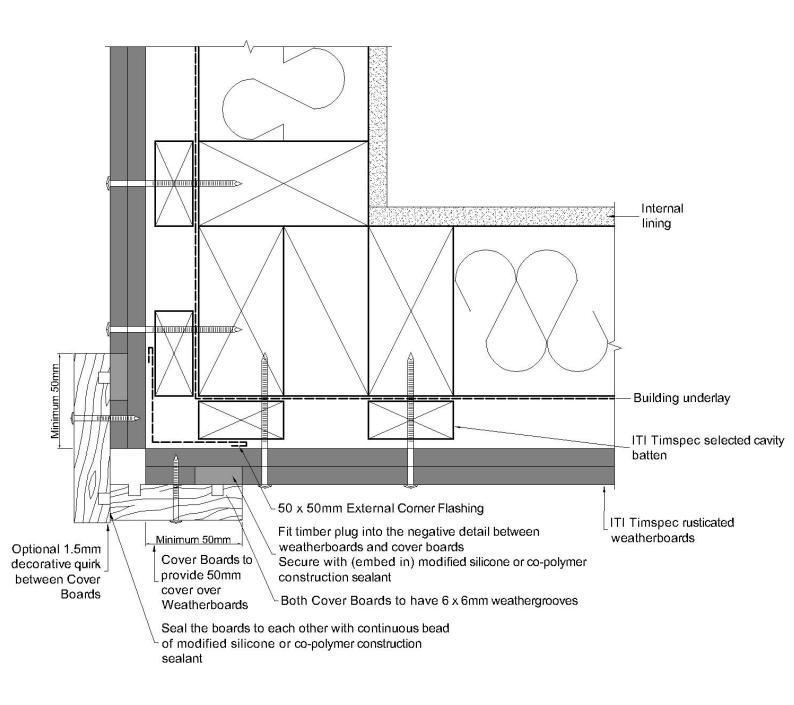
12 RC 404 EXTERNAL CORNER - P42 CORNER MOULDING
